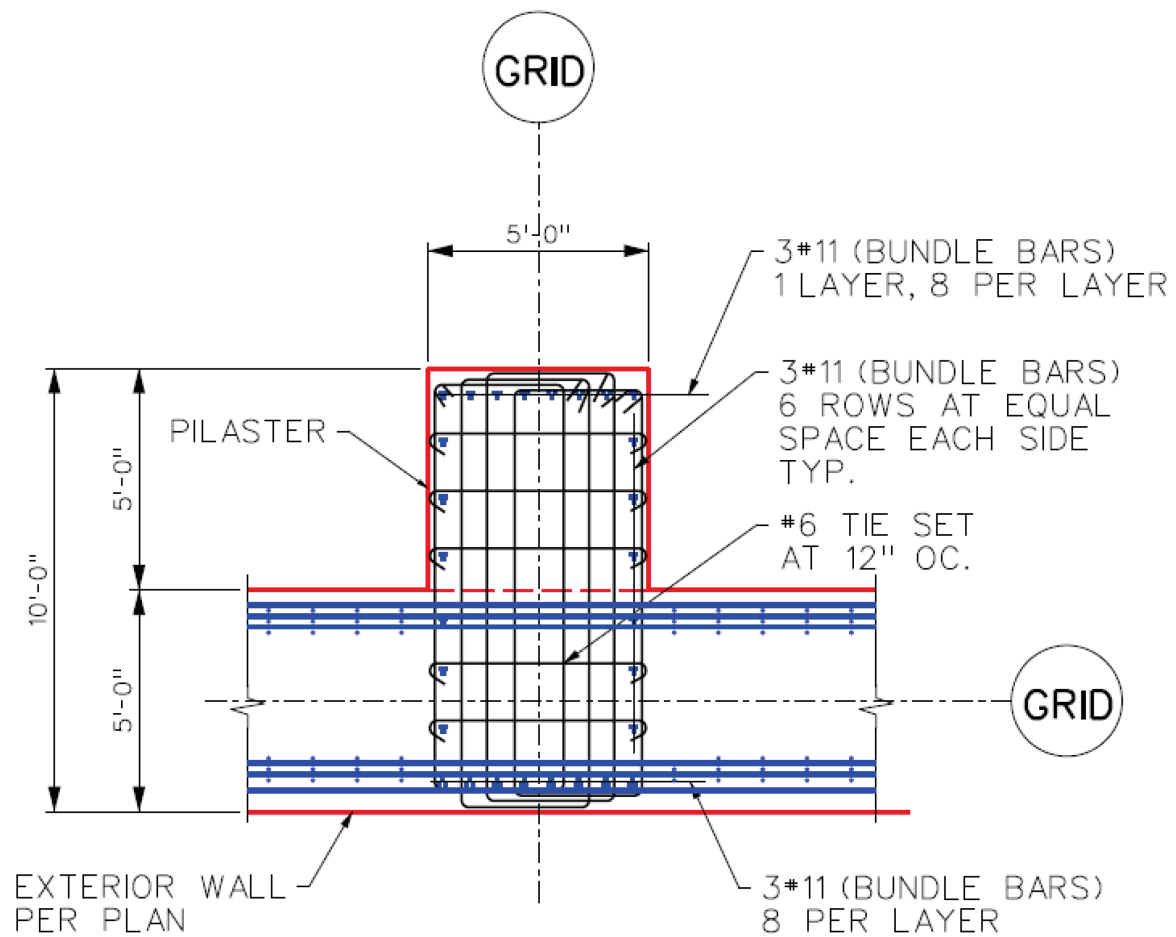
B-33: RXB Reinforcement Detail for Pilaster Type 2
